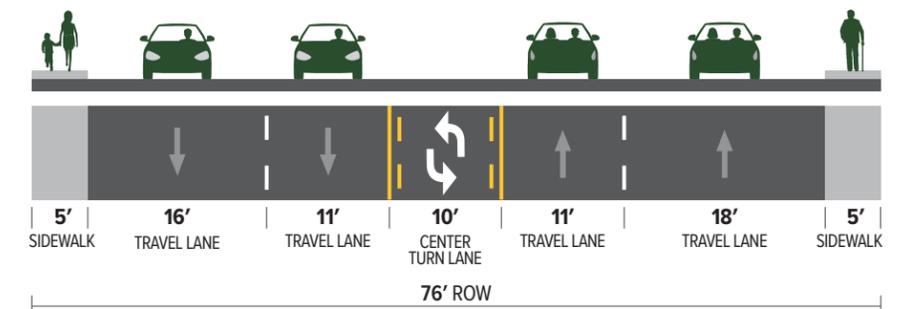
BELL AVENUE TO I-80 EXISTING CROSS SECTION
